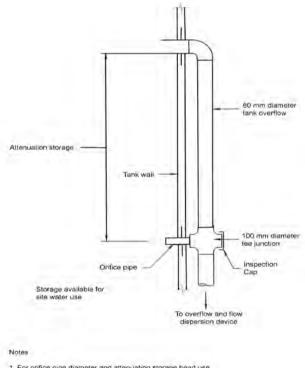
Water tank schematic showing case study elevations and volumes
